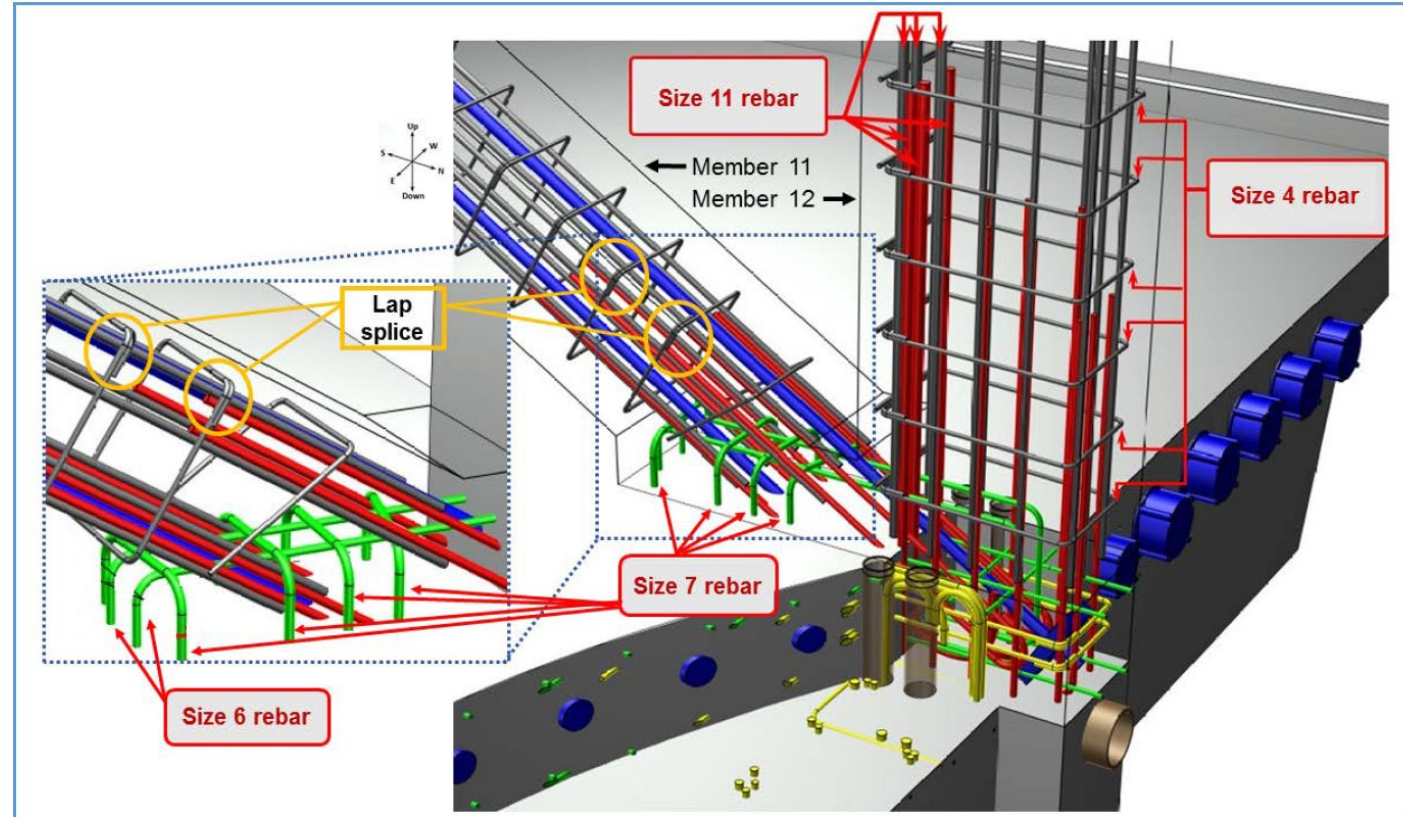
Main span, north end, showing rebar detailing in member 11, member 12, and node 11/12. Inset shows another view of rebar in node 11/12 and detail of lap splice from member 11. (Source: FHWA 2019)
